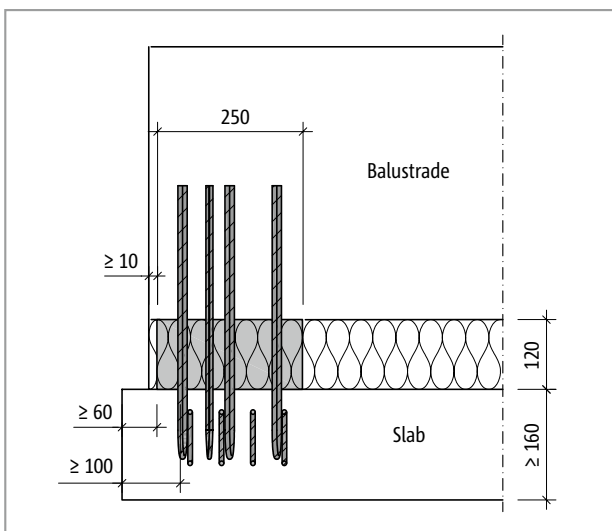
Schöck Isokorb® XT type A: View of edge spacings
